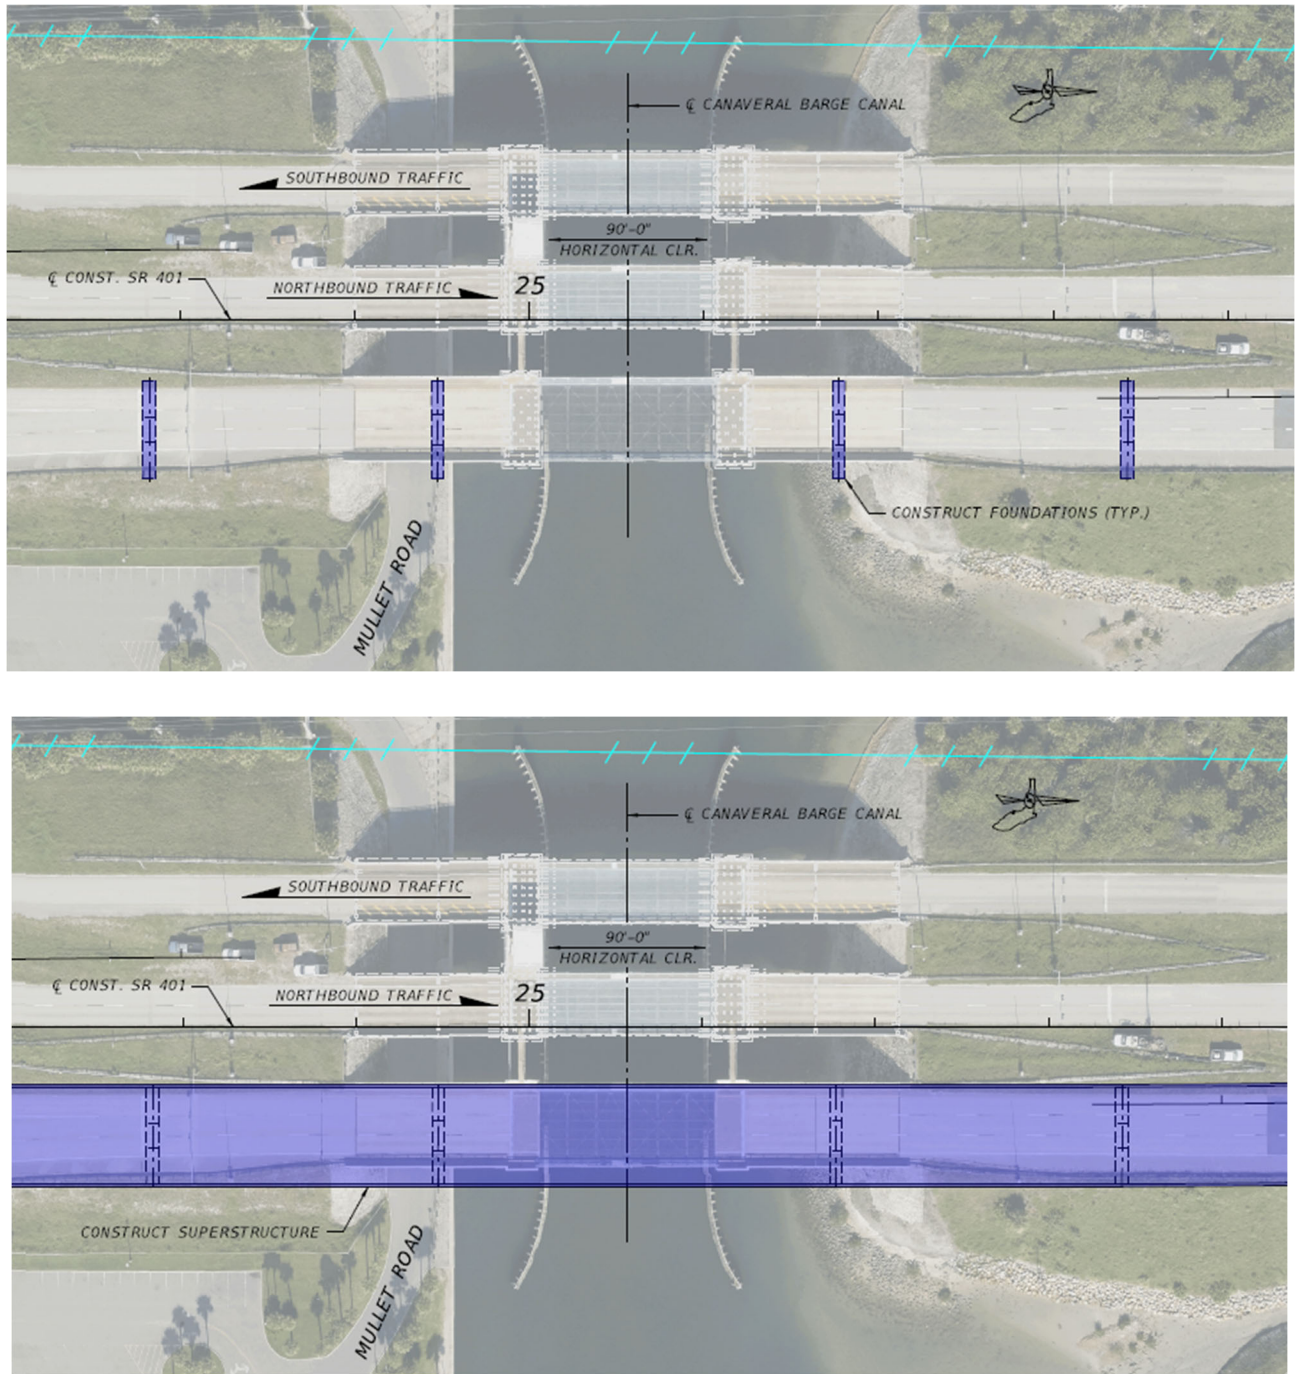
Traffic Control Plan Phase II-Construct NB Bridge
